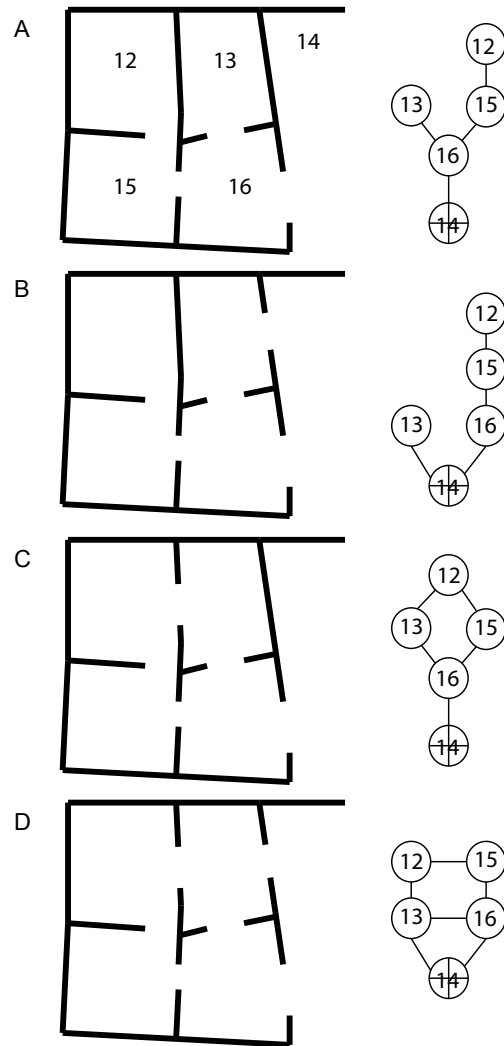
Operation 103 building. Right: Room access diagram, Left: Simplified building plan with room numbers.
